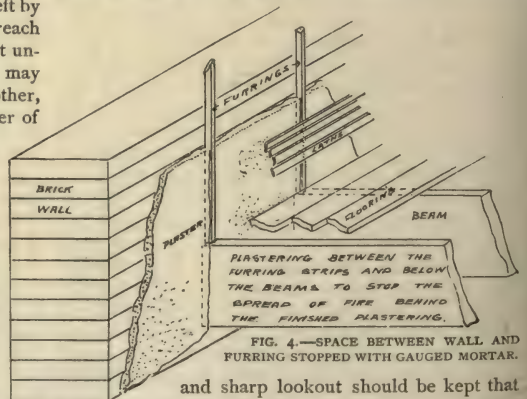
SPACE BETWEEN WALL AND FURRING STOPPED WITH GAUGED MORTAR.
